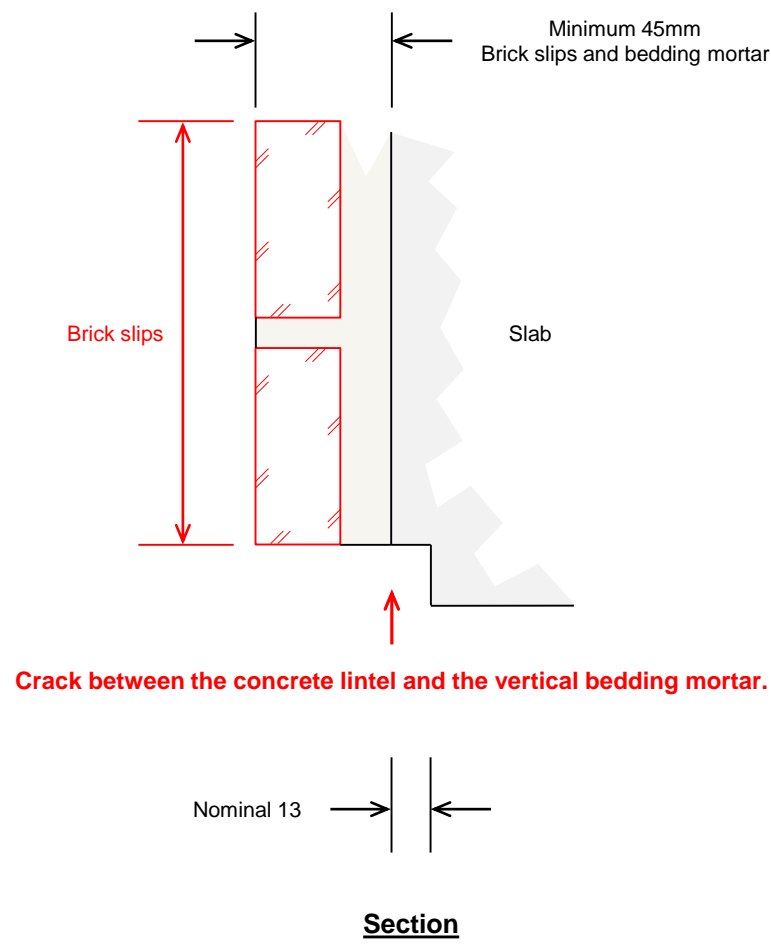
Location 11. Side Elevation. Second Floor. Slab Edge.
